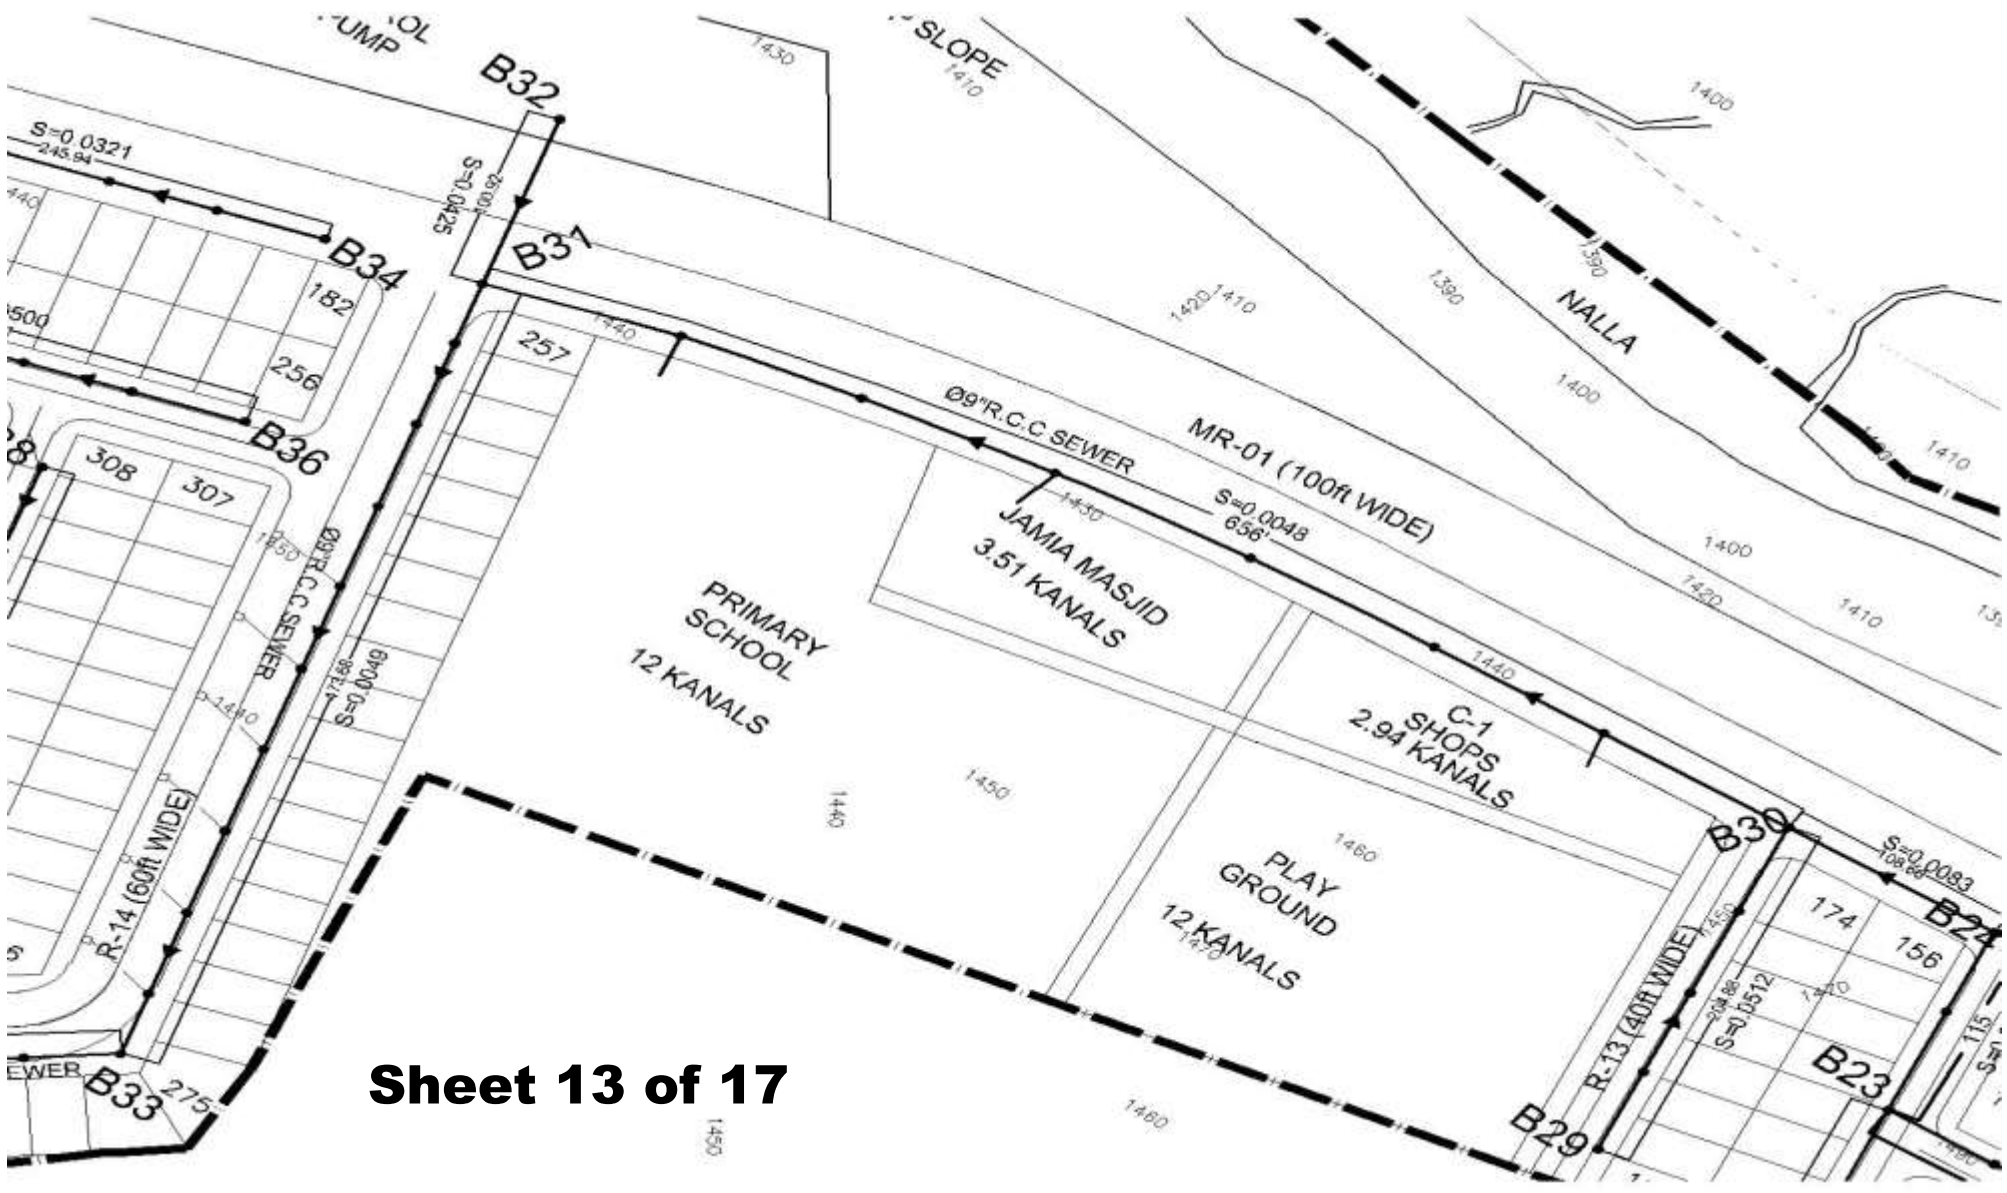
Sewer layout plan of Zone-2 at junction of MR-02 and MR-01
